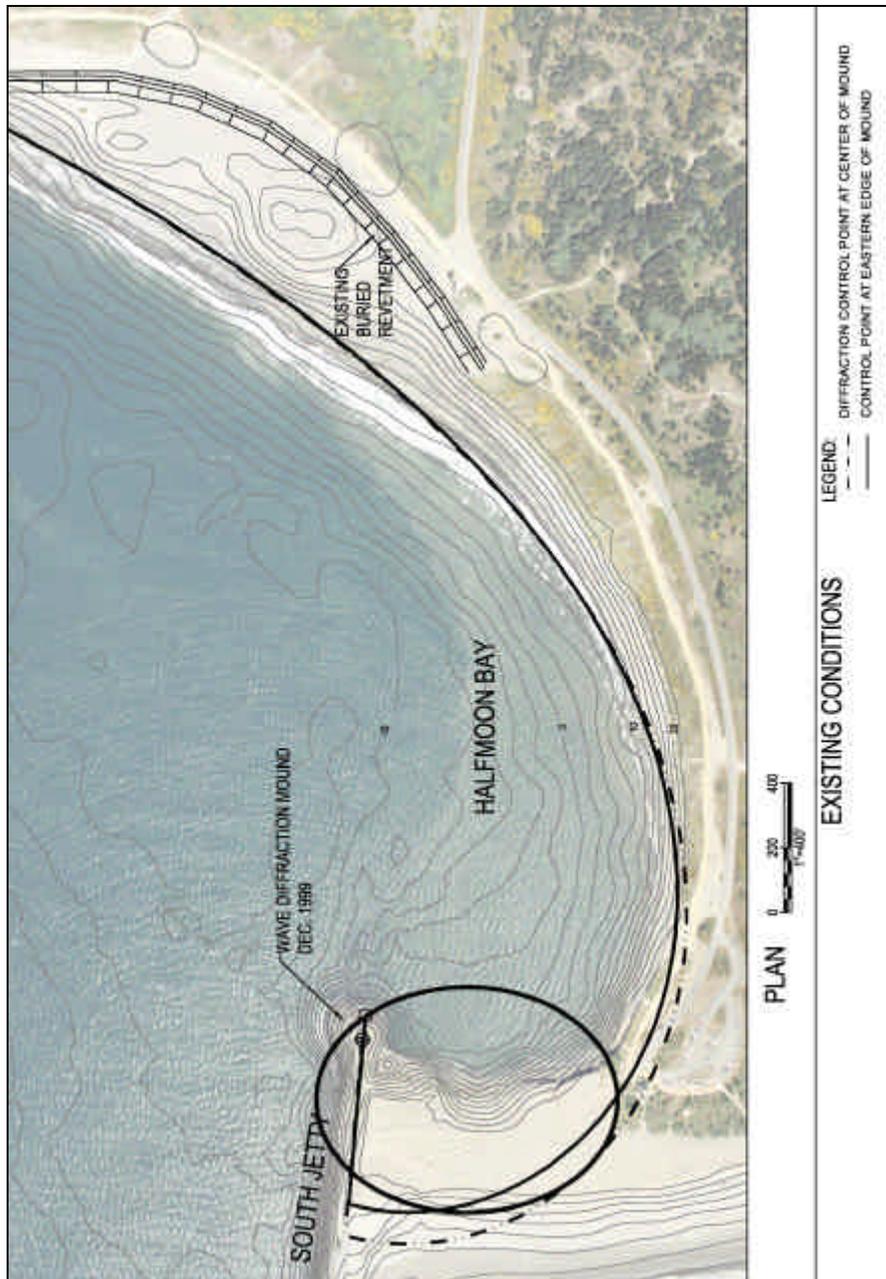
Half Moon Bay equilibrium shoreline planshapes
